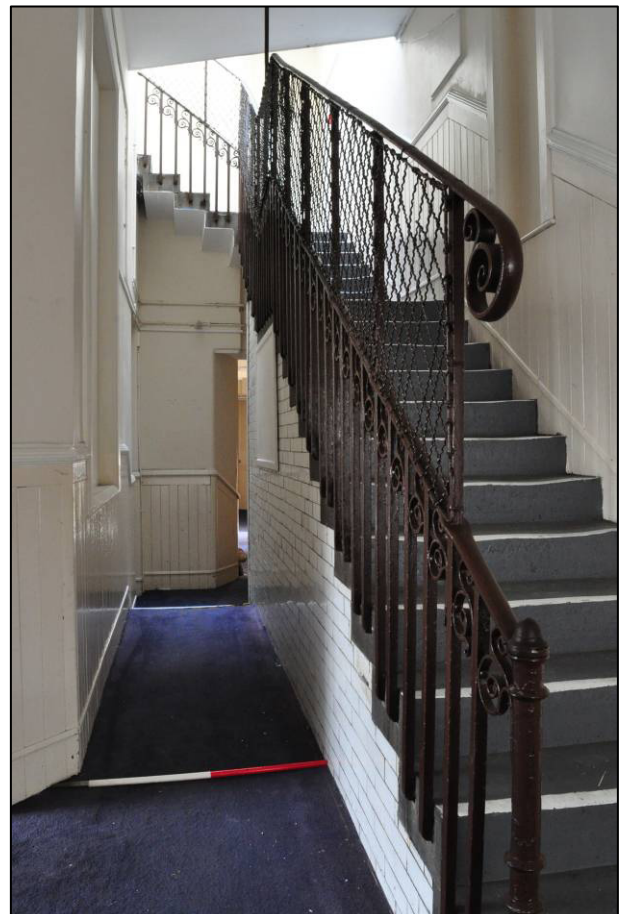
1879 Board School, corridor (GF11), and stairs, looking E (photo 2407).
